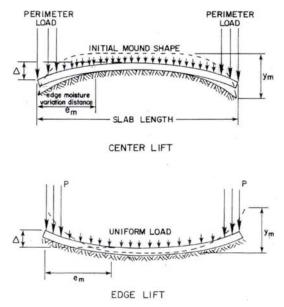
Figures 5.1 and 5.3 from PTI Design of Post-Tensioned Slabs-on-Ground, third edition, 2008.
